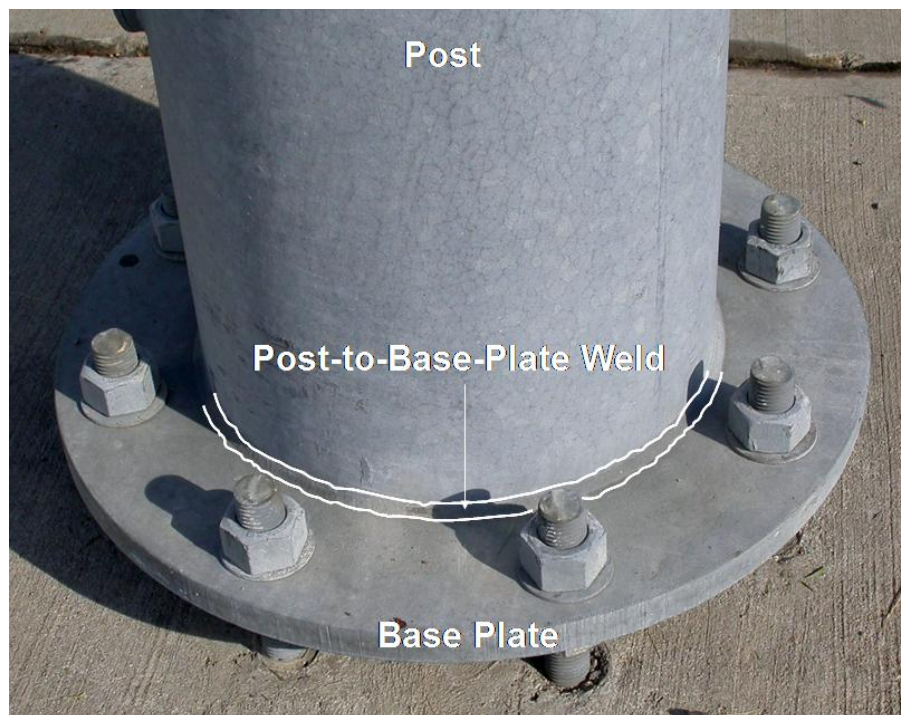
Post-to-base-plate weld connection for a tri-chord sign structure.
